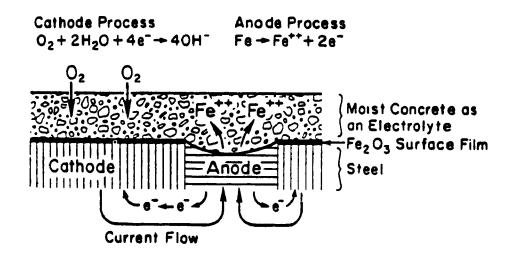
TYPICAL CORROSION OF STEEL REINFORCEMENT IN CONCRETE
